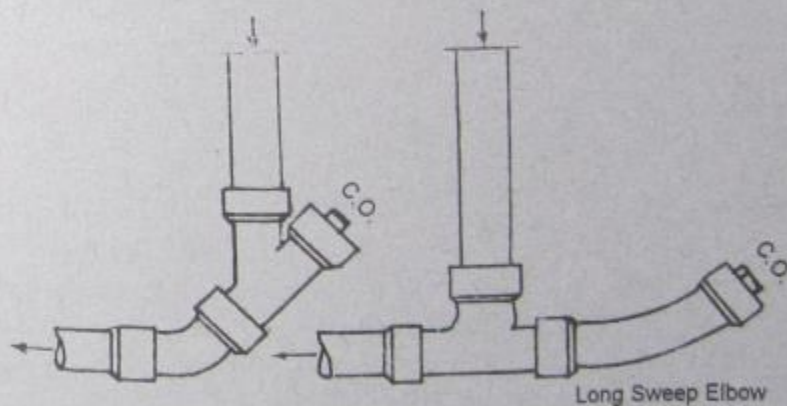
THE HOUSE DRAIN CLEANOUT
